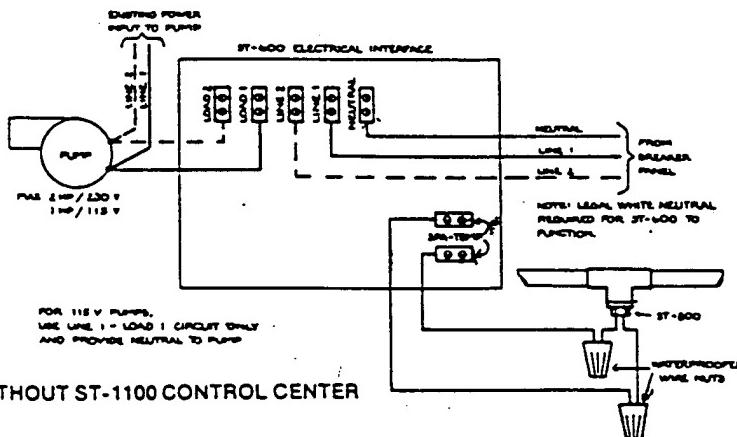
WIRING PUMP WITHOUT ST-1100 CONTROL CENTER
